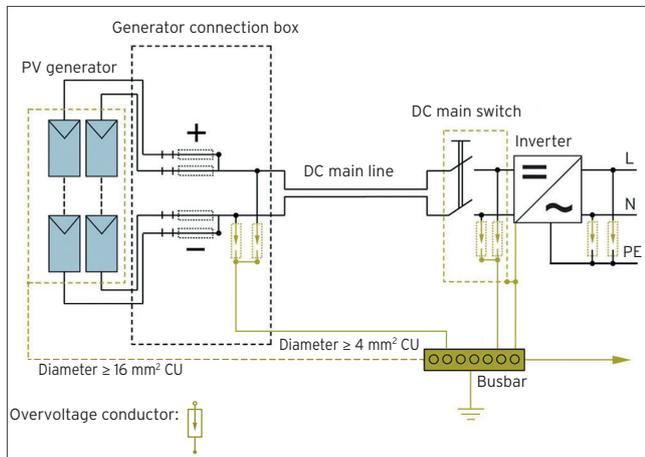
Wiring diagram for a grid-connected PV installation with overvoltage protection (without including a lightning protection system)
